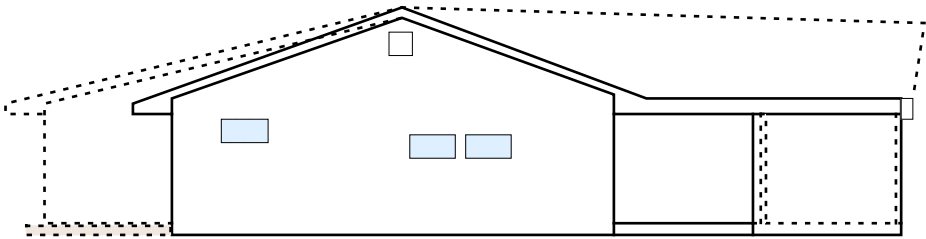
Elevation view existing house viewed from outside from east looking west. Solid lines and dotted lines to the north of the roof peak, (to the right in the diagram, towards the street) are the existing house. The dotted roof line to the north is in the middle of the occupied (i.e. non-carport) part of the north part. Dotted lines to the south give an elevation view of the addition. The small rectangle is the location of possible heat
